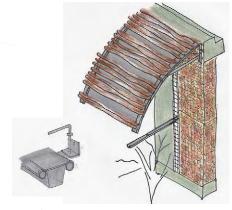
Shading structure and Feeding Tray.1 – Stabili– zation; 2 – Wall brackets; 3 – Rod supports. (See section 7, drawing B6)
